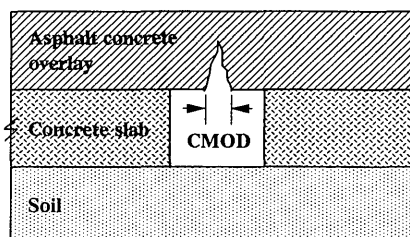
Crack mouth opening displacement (CMOD) in the concrete pavement system.
